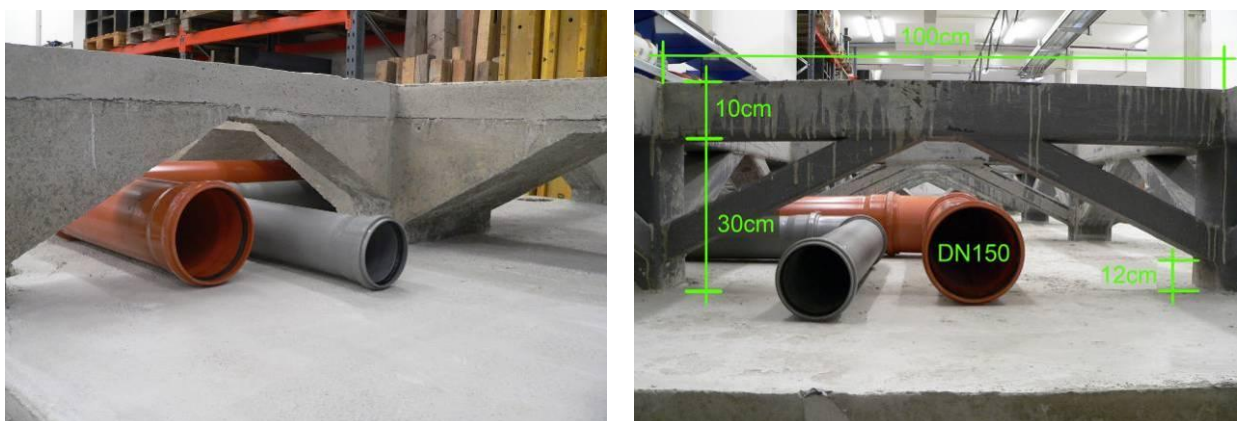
Cross sections of specimen 1 (left) and specimen 2 (right).
